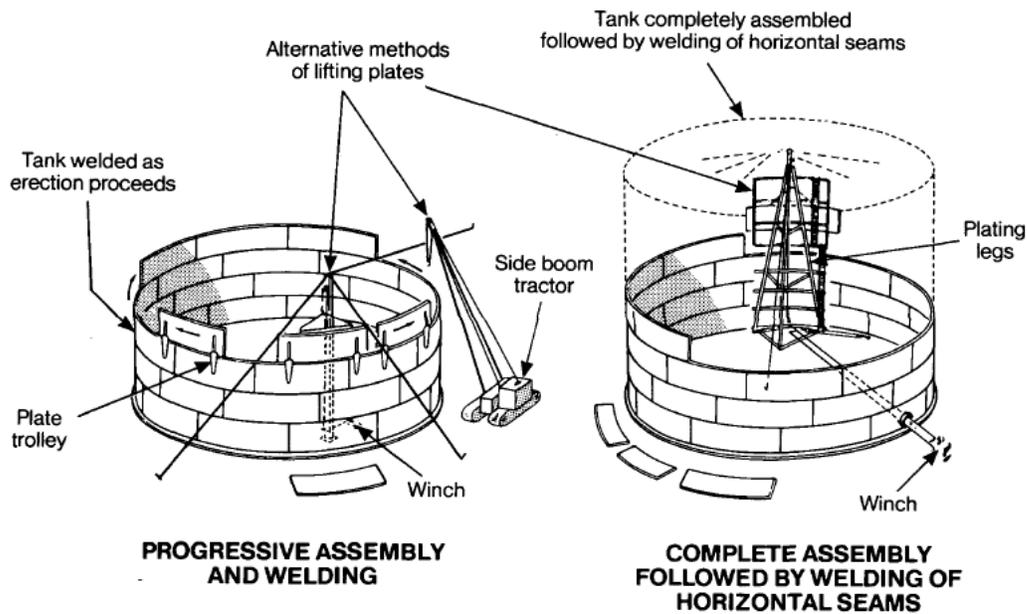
(a) Progressive Assembly & Welding and Complete Assembly Followed by Welding of Horizontal Seam Method for Welded Vertical Tank [PTS, 1986]
